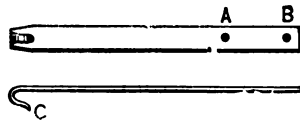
Plan and Side View of Wrought Iron Gutter Brace.
